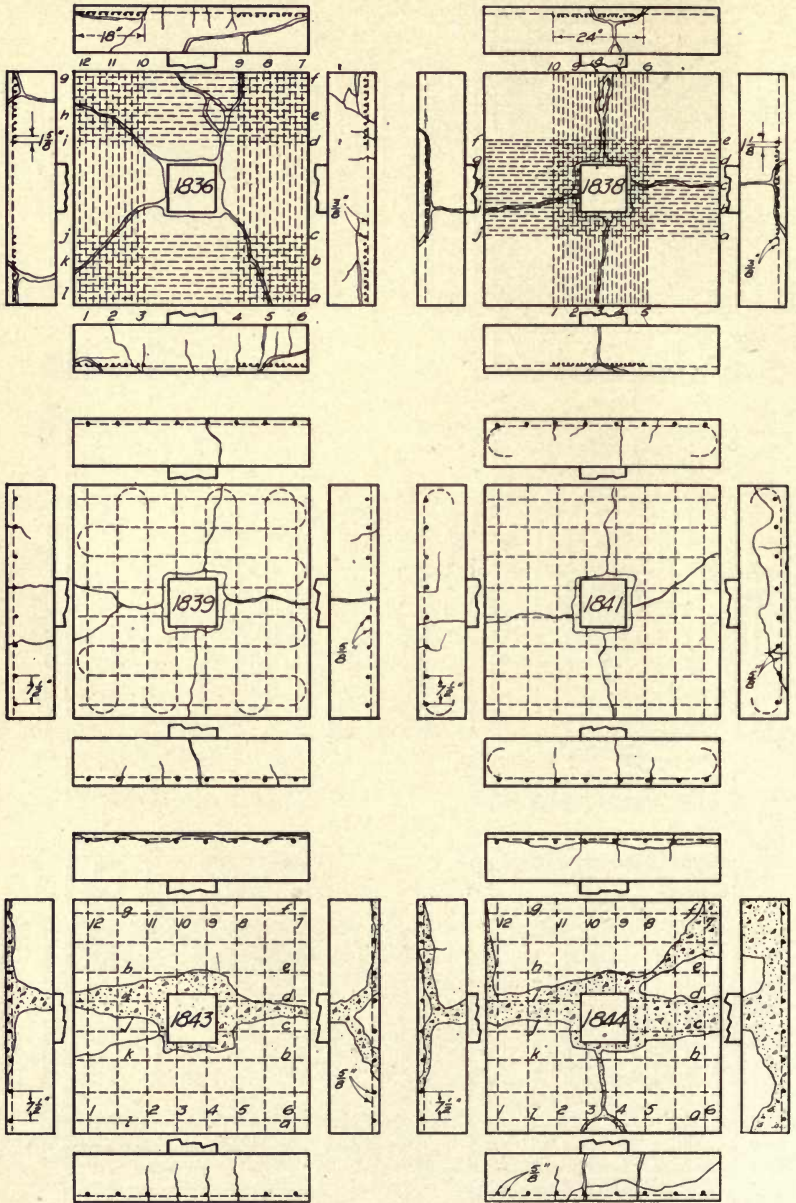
REINFORCED CONCRETE COLUMN FOOTINGS.
